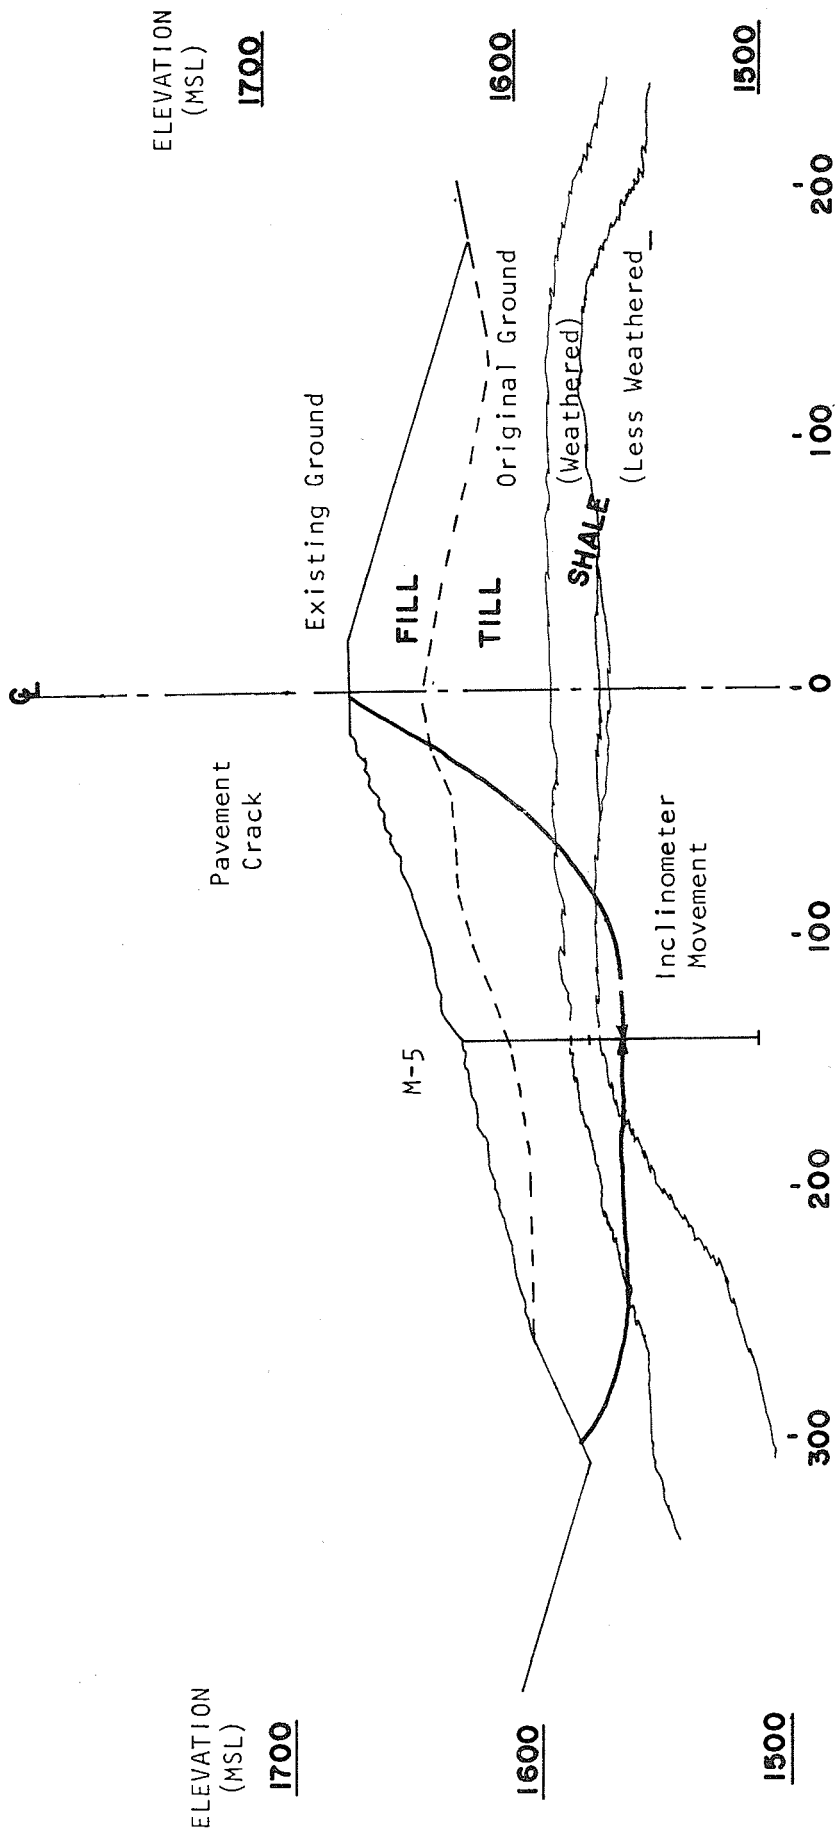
Section Through Approach Fill Showing General Stratification and Assumed Failure Plane.
